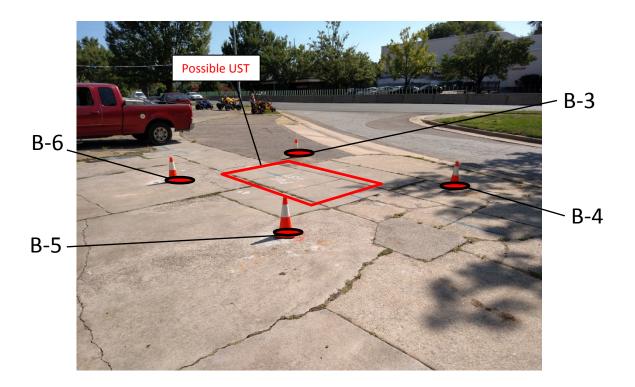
A view of the location of the possible UST, and Borings B-3 through B-6, facing northeast.
